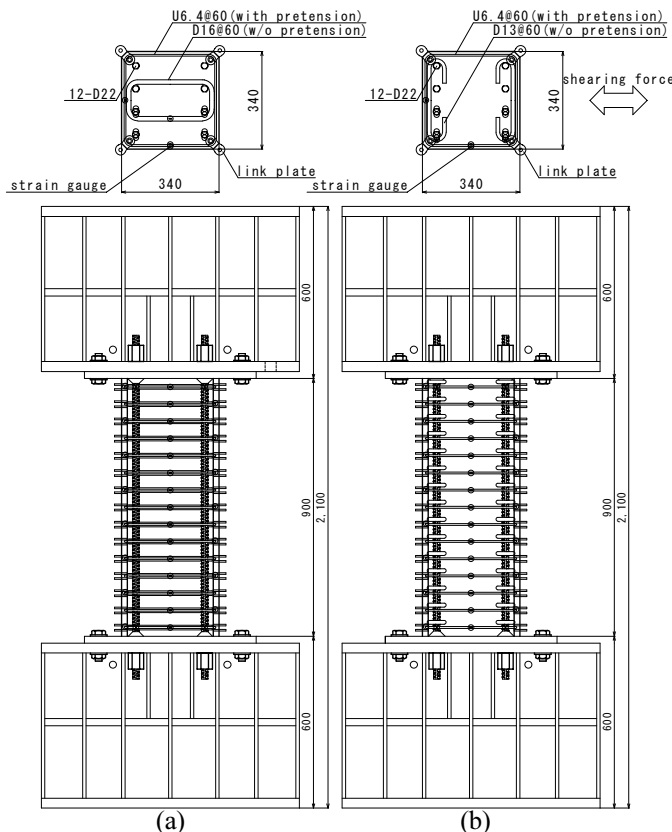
Details of Test Specimens: (a) No.1-3, and (b) No.4 and 5
